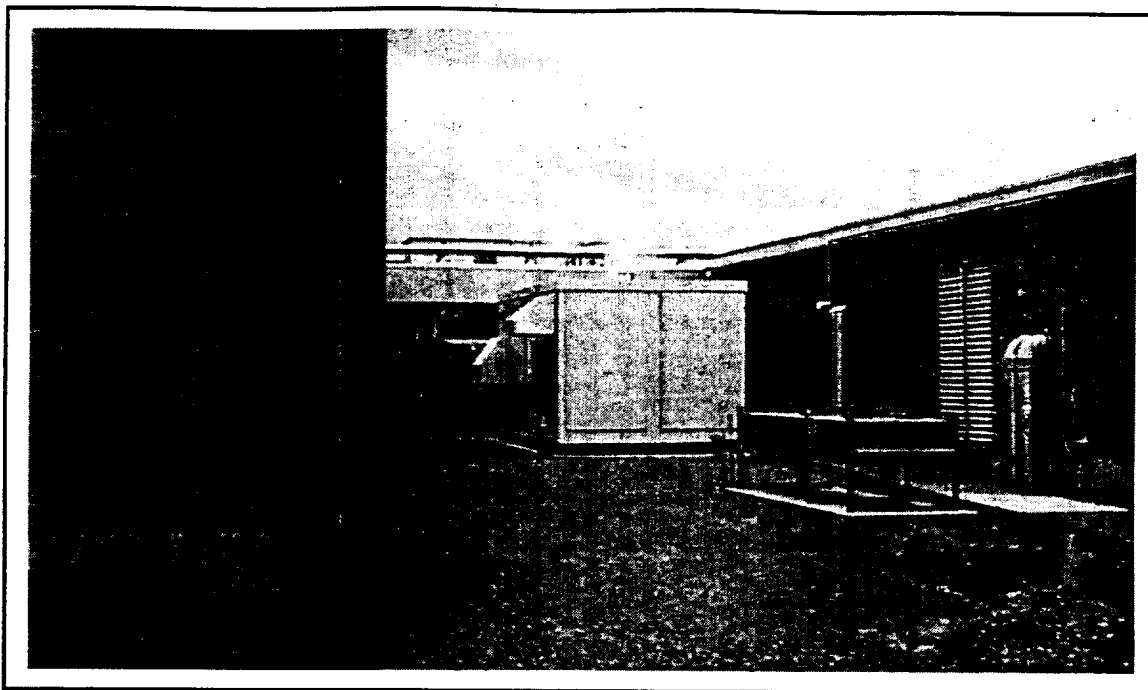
Fuel cell installed at site with cooling tower in foreground.
